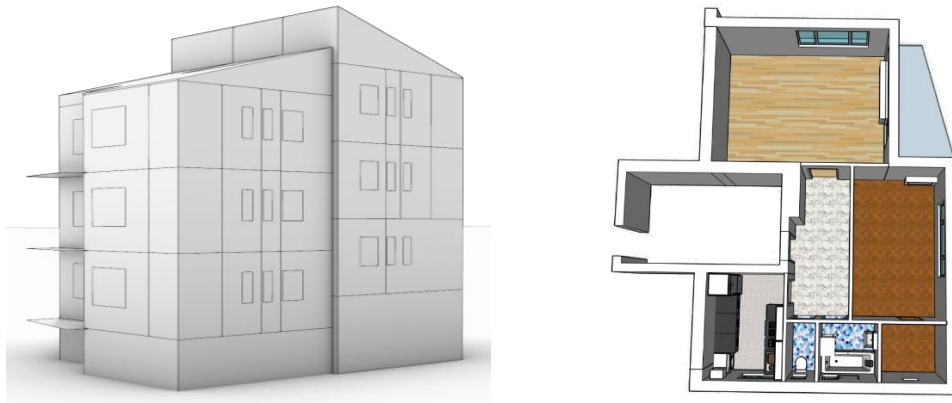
Test Case Building with 6 flats on 3 stories, left: 3D visualization, right: floor plan
